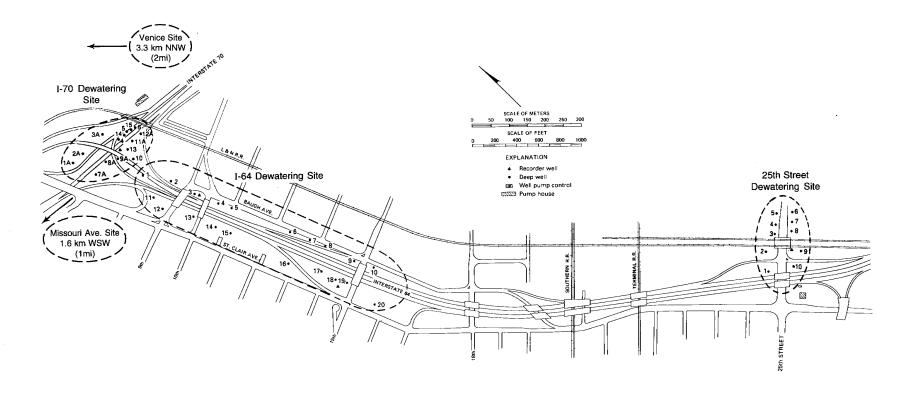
Locations of dewatering wells at the I-70 Tri-Level Bridge, I-64, and 25th Street
